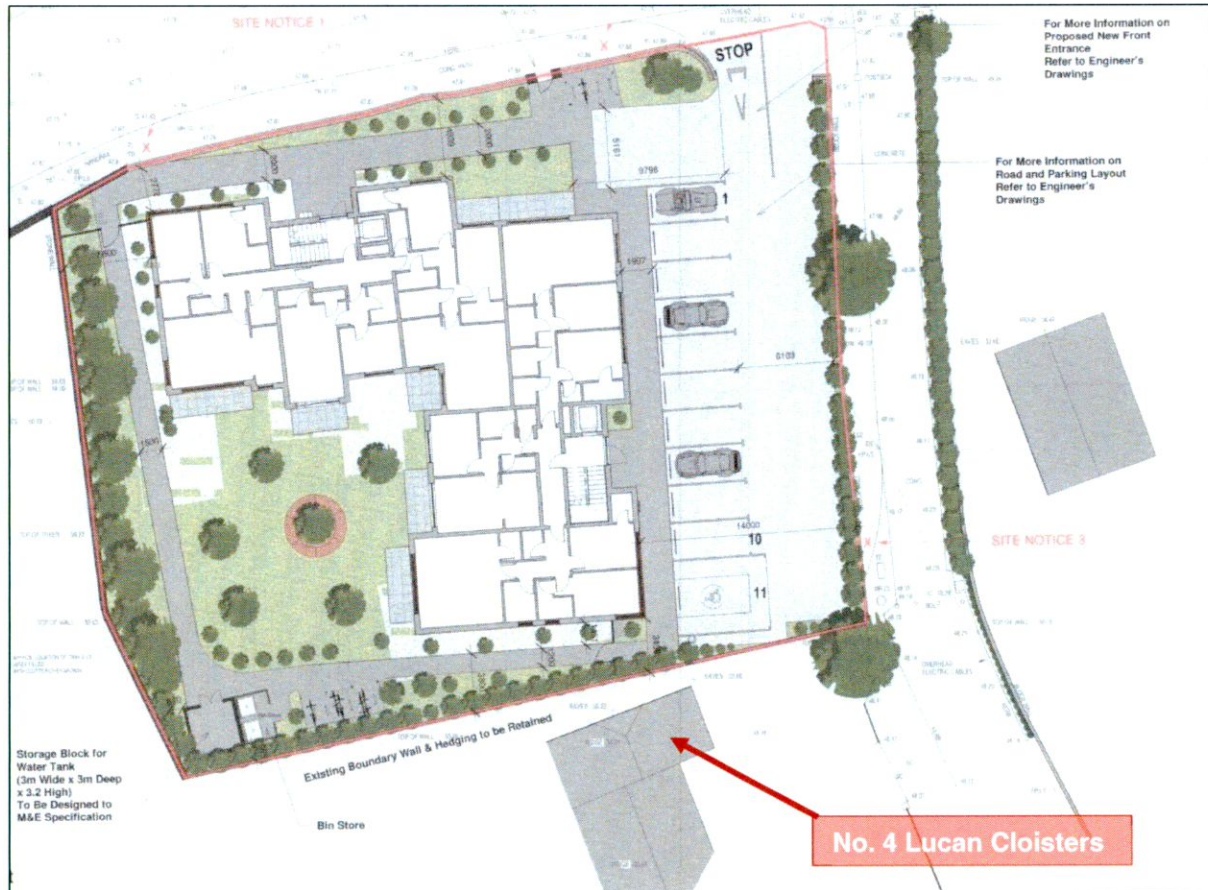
Extract from site layout plan, showing the close proximity of the bin to No. 4 Lucan Cloisters.
